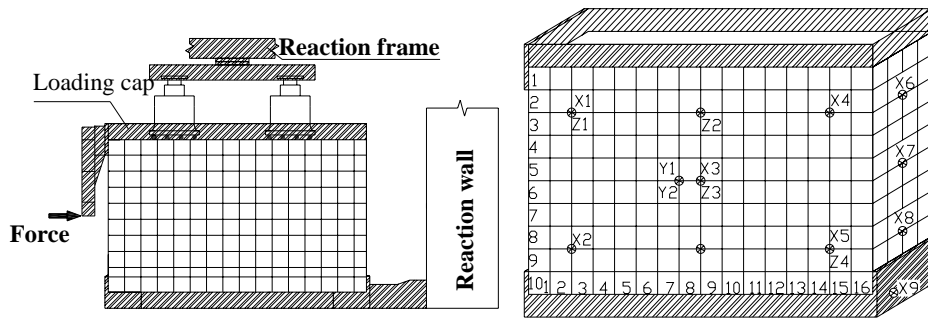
Rammed earth wall reinforcement test device and layout of dial indicators
